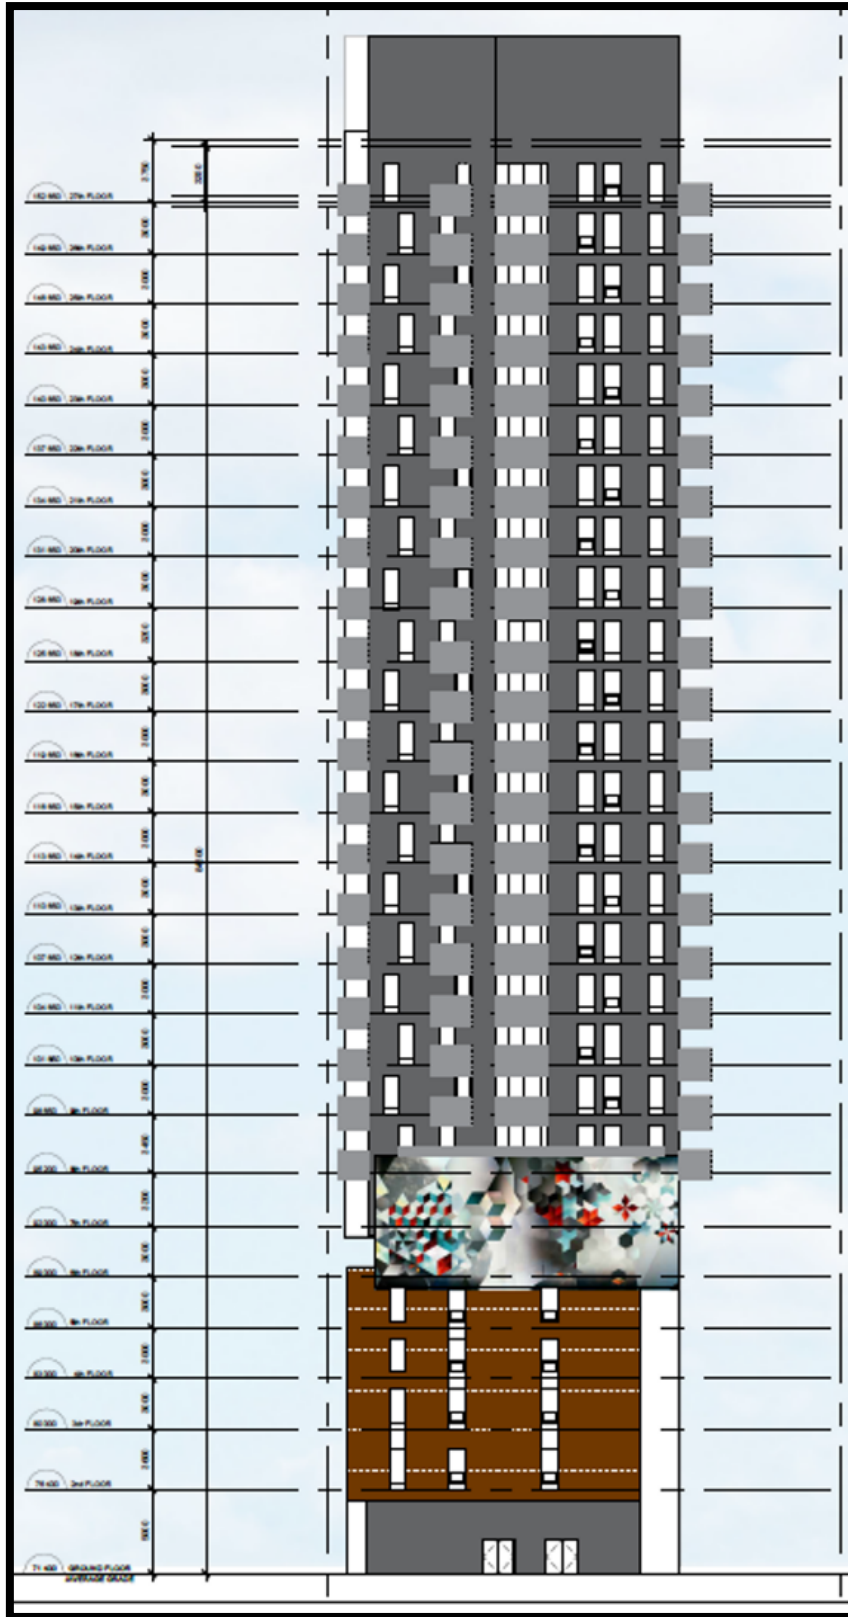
Proposed east elevation for 84 & 100 Gloucester Street. Source: Fotenn, EVOQ and Claridge Homes, *84 & 100 Gloucester Street, Design Brief, Zoning By-law Amendment Application*, 20 January 2023.
